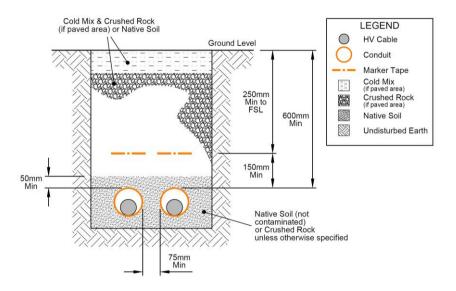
Typical Trench Section - 600mm Minimum Cable Burial Depth (2 Conduits shown)
